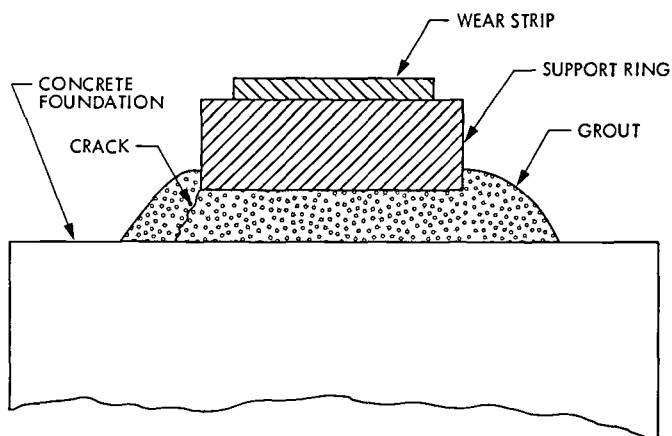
Cross section of track showing cracked grout shoulder on outer side
